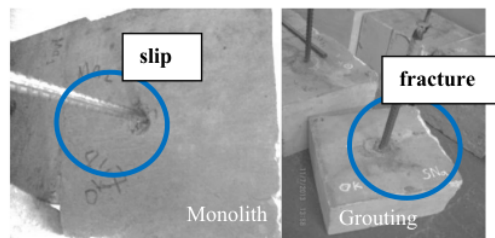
The failure pattern of experiment spesimen with steel bar embedded into concrete 120 mm
